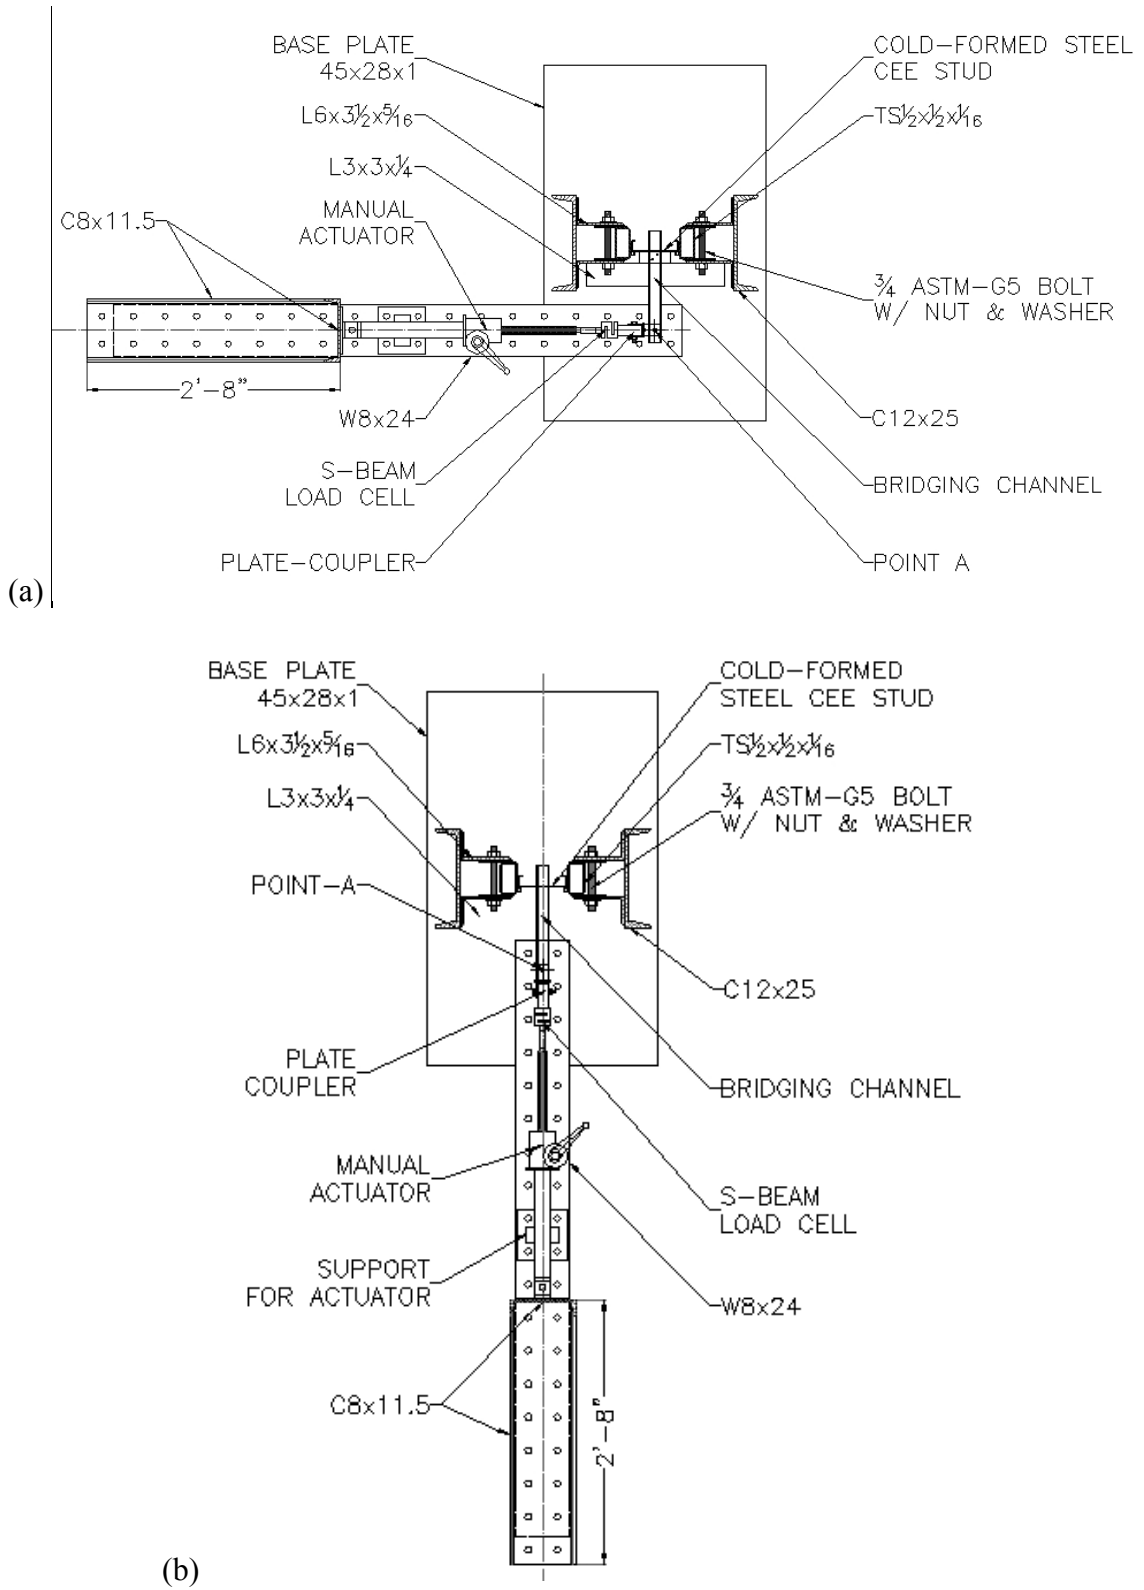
Schematic Plan View of the (a) Out-of-Plane Bridging Test (b) In-Plane Bridging Test
